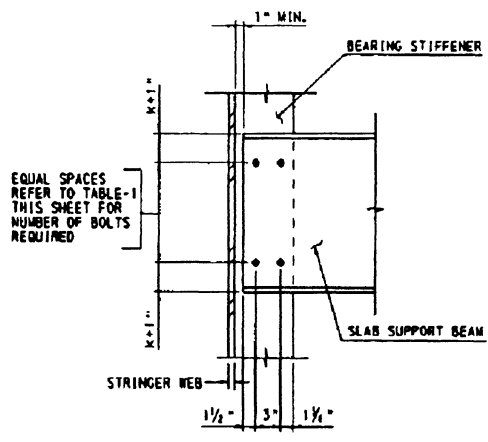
Pennsylvania Standard Steel Diaphragms for Steel Beam/Girder Structures (Straight Girders Only), 1994
